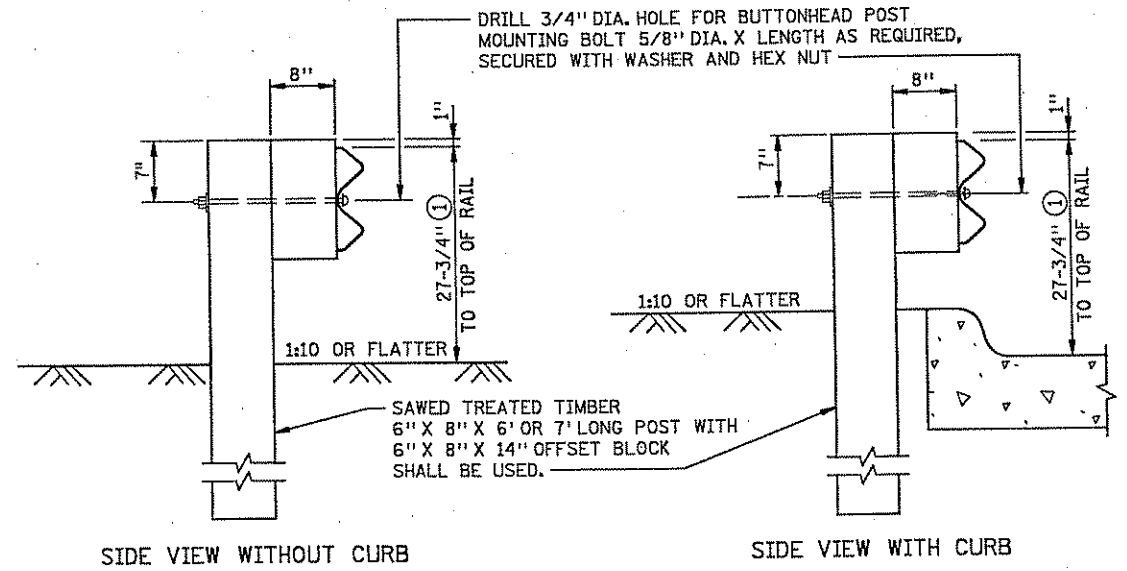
DETAILS OF W-BEAM TO THRIE BEAM TRANSITION SECTION
